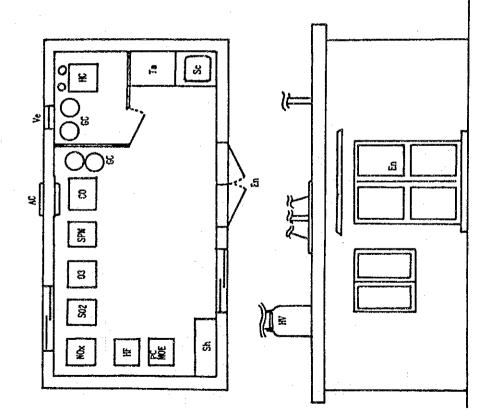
LAYOUT PLAN FOR INSPECTION STATION
